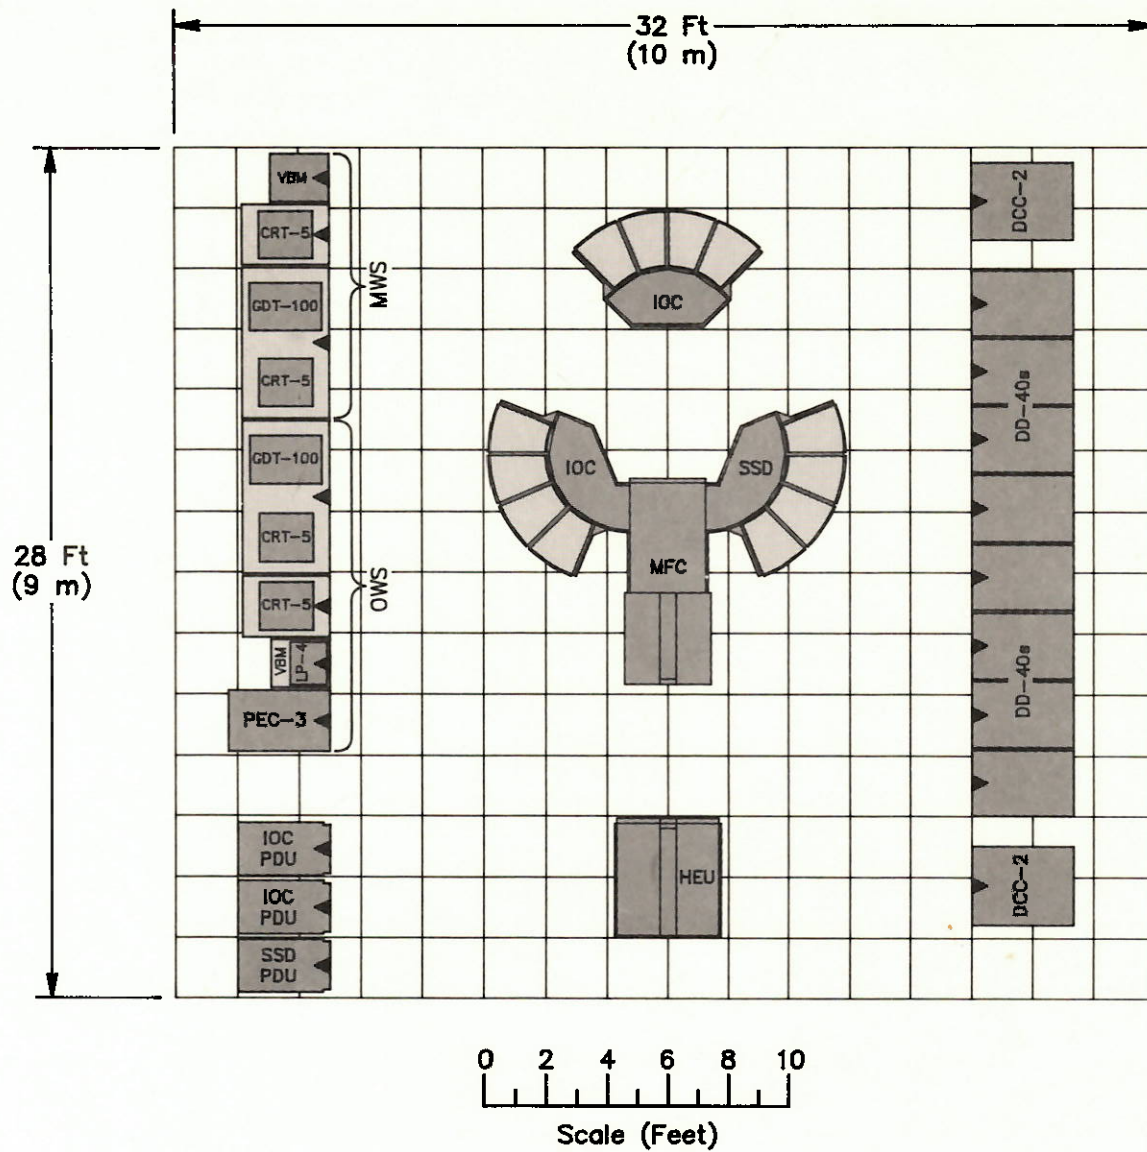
Typical Computer Room Floor Plan for a CRAY Y-MP8 Computer System
